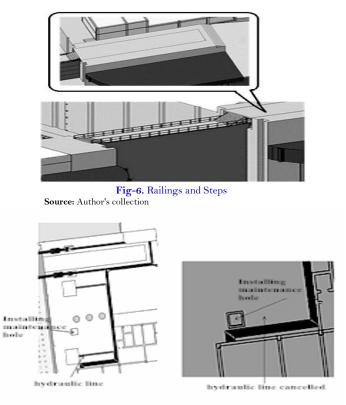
Installation of Manhole and Adjustment of Hydraulic Pipeline Source: Author's collection
